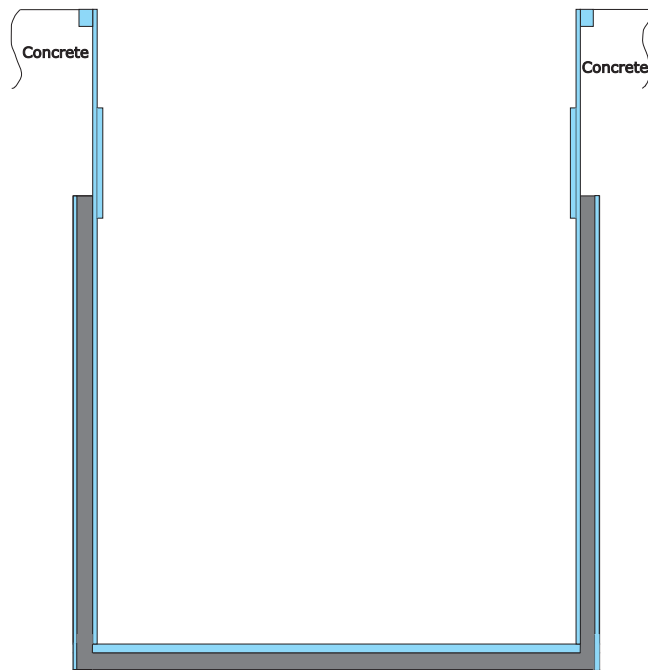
The inner construction parts after removal of the top shield ring, the reactor tank and the graphite reflector are the inner and outer steel tanks.
